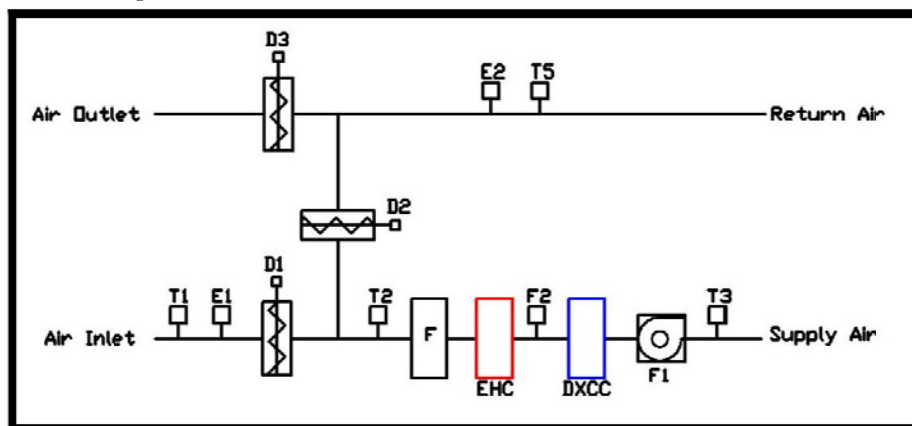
Schematic of a Typical Retail Rooftop Air Handling Unit
